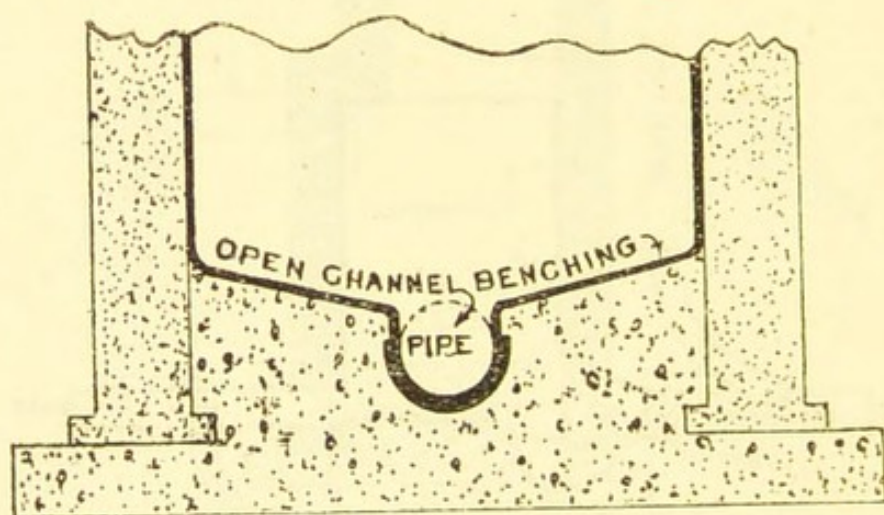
CROSS SECTION THROUGH BOTTOM OF A MANHOLE.
